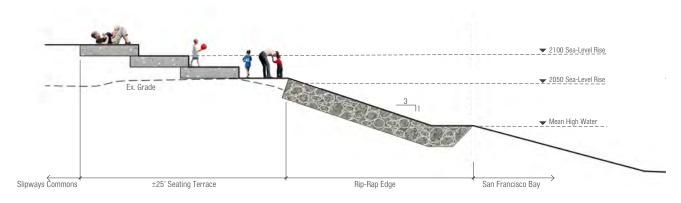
Illustrative Shoreline Section 4 Note: All dimensions and elevations are illustrative only.
